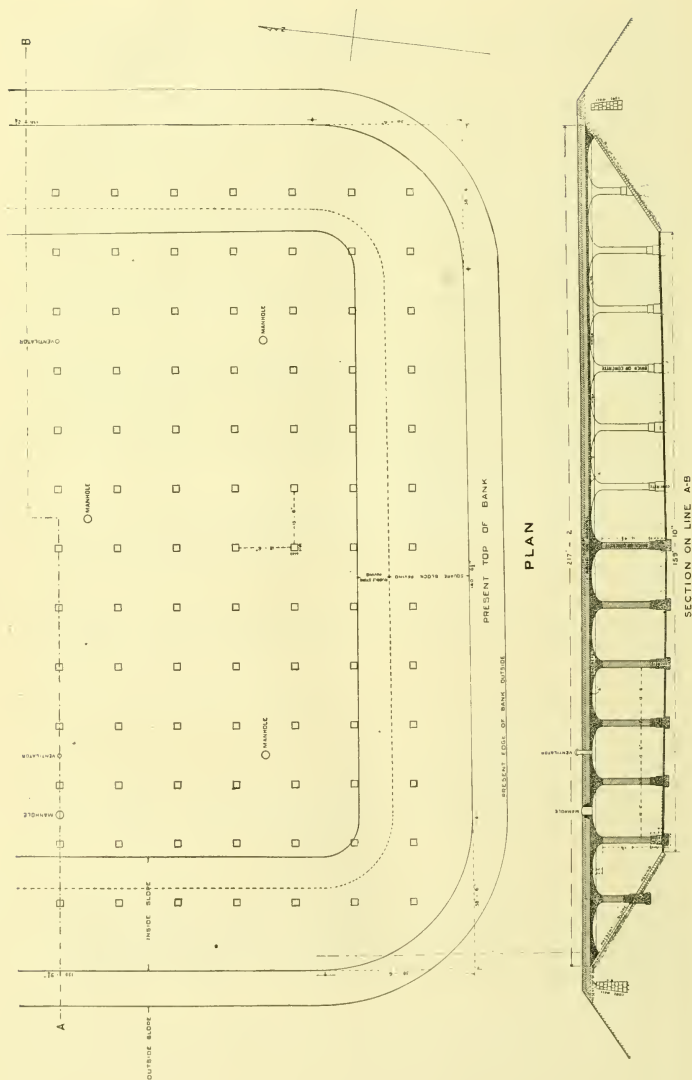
PLAN AND SECTION OF CONCRETE ROOF OF NATICK RESERVOIR.
